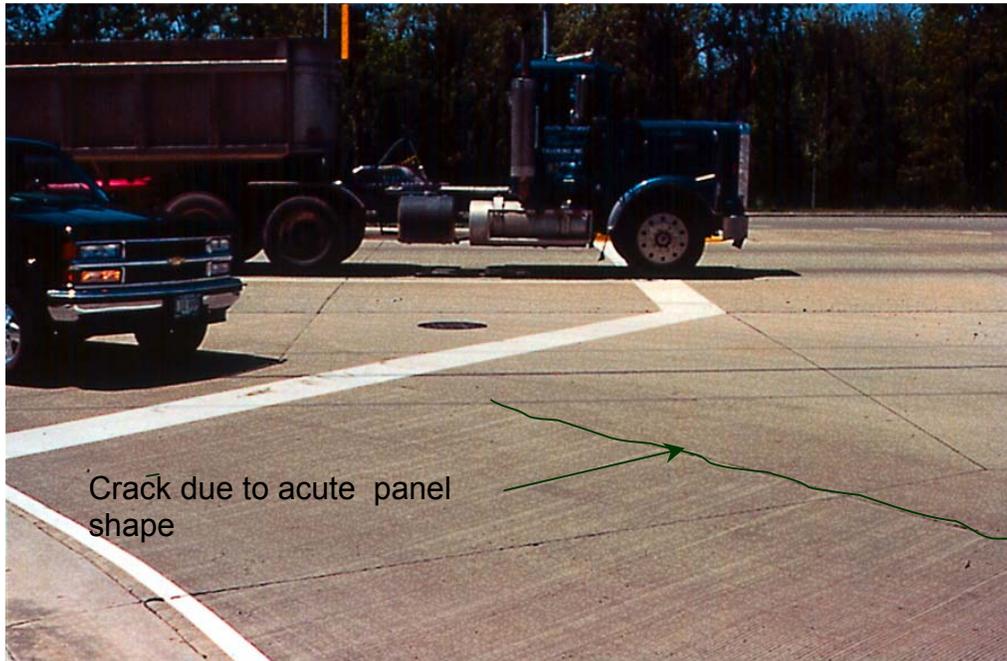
Cracking that resulted from an irregularly shaped panel (Photo courtesy of American Concrete Paving Association).
